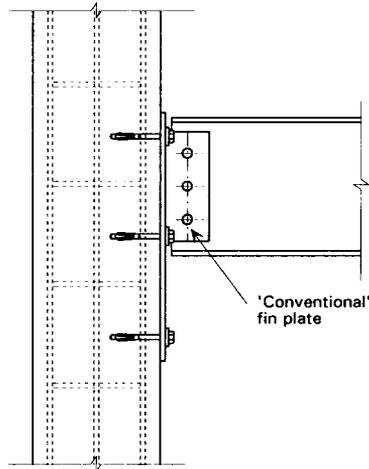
Attachment plate fixed to wall using proprietary anchors
